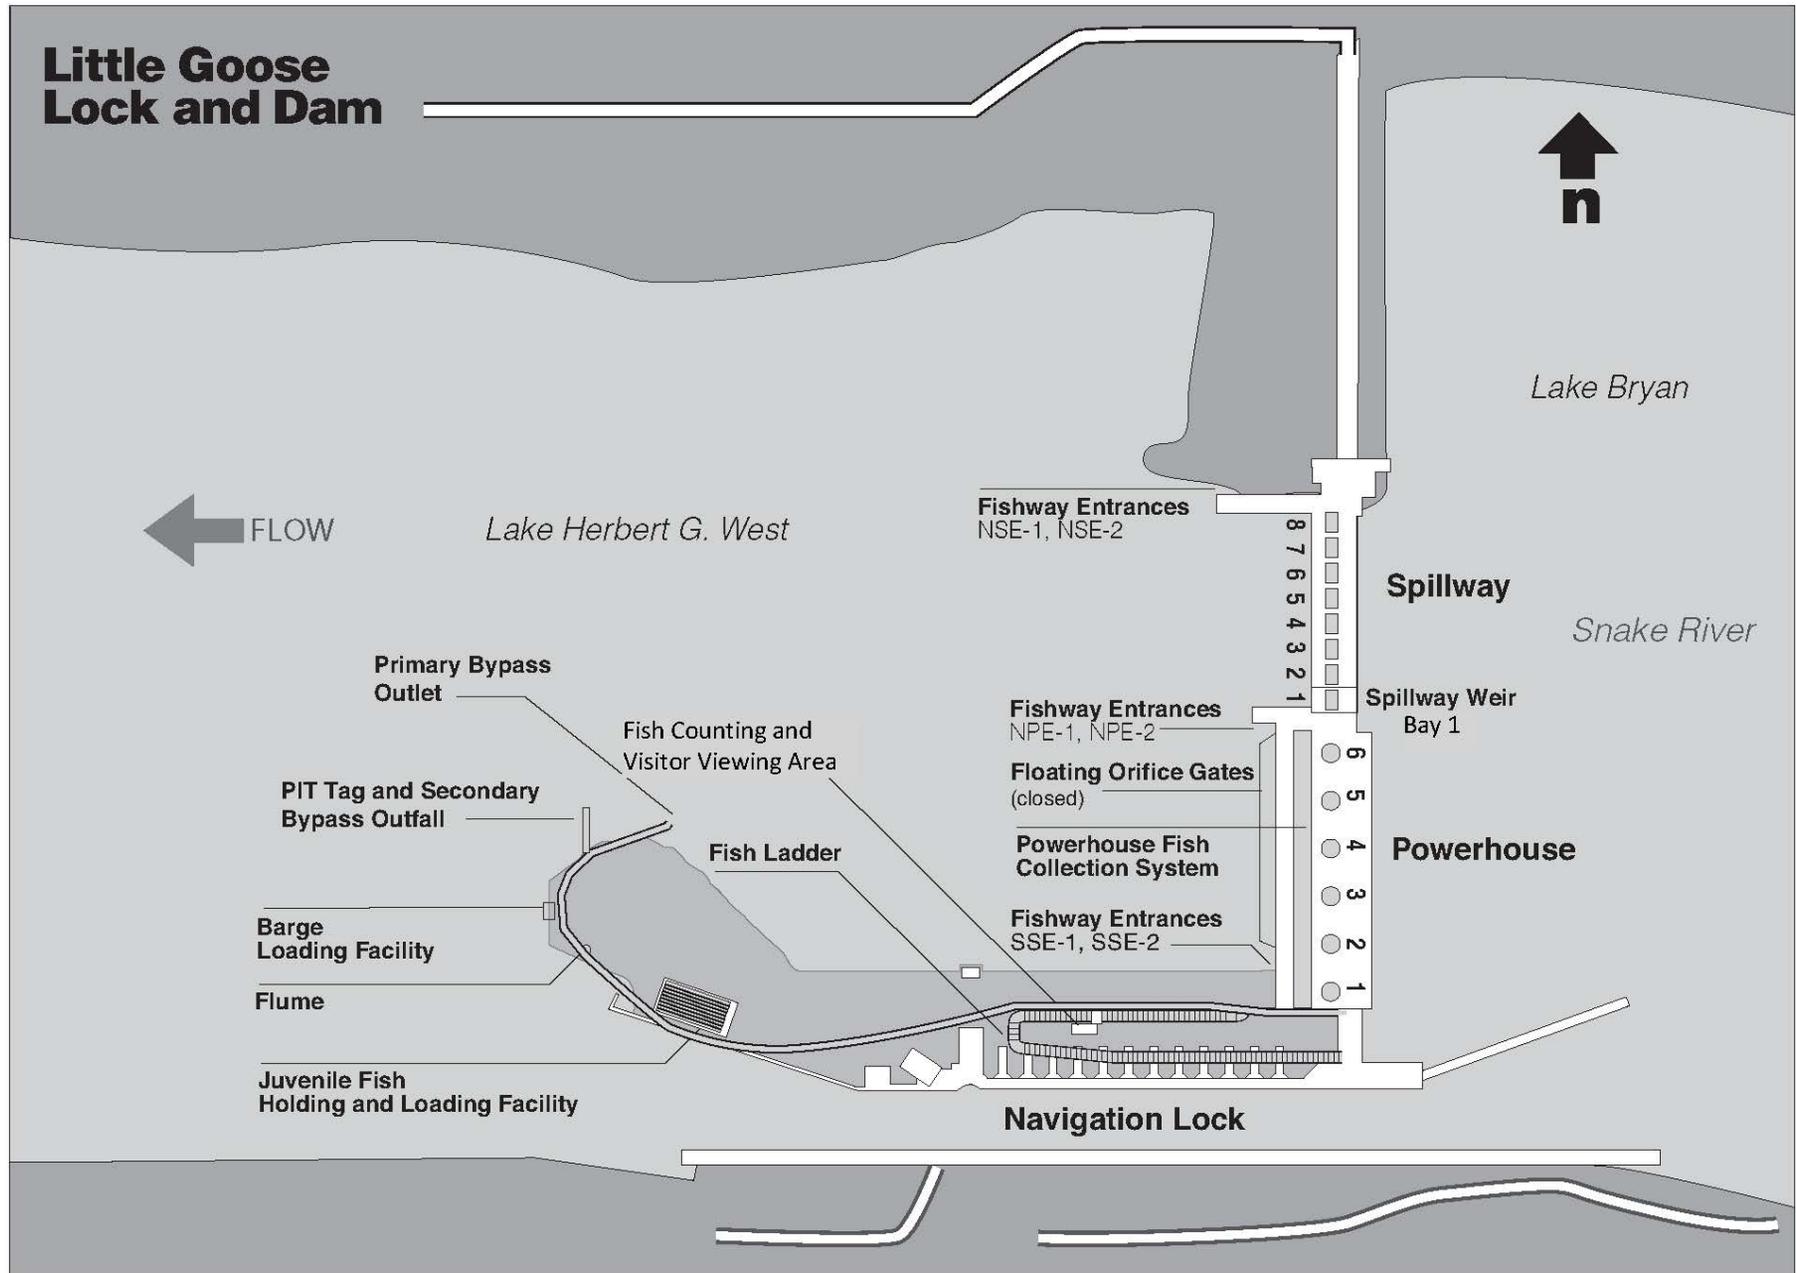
Little Goose Lock & Dam General Site Plan.
